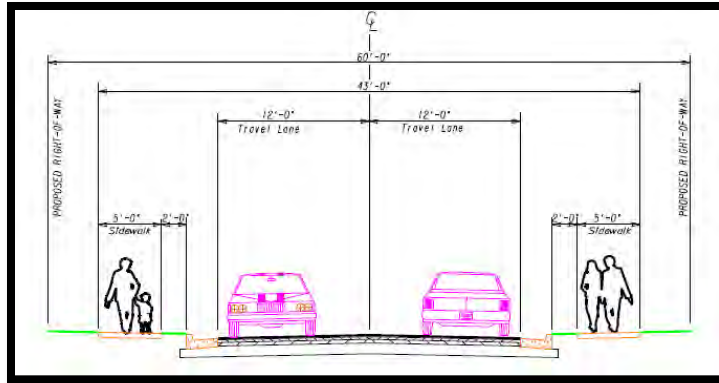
Proposed Typical Section – Alternative 5A – North Commons Street Extension
